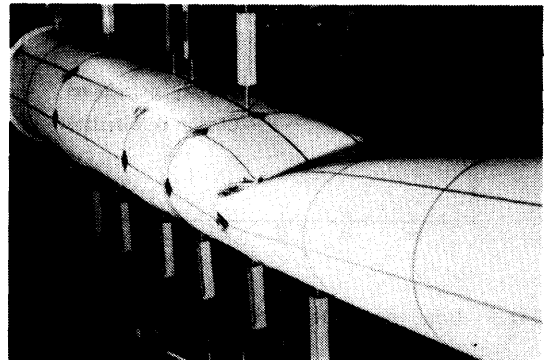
Deformation pattern of tubular pipe (Specimen III)
